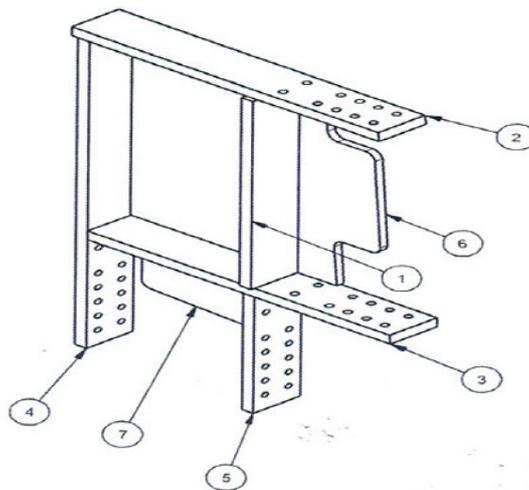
Detail of hollow-flange Long Span Beam portal knee connector
